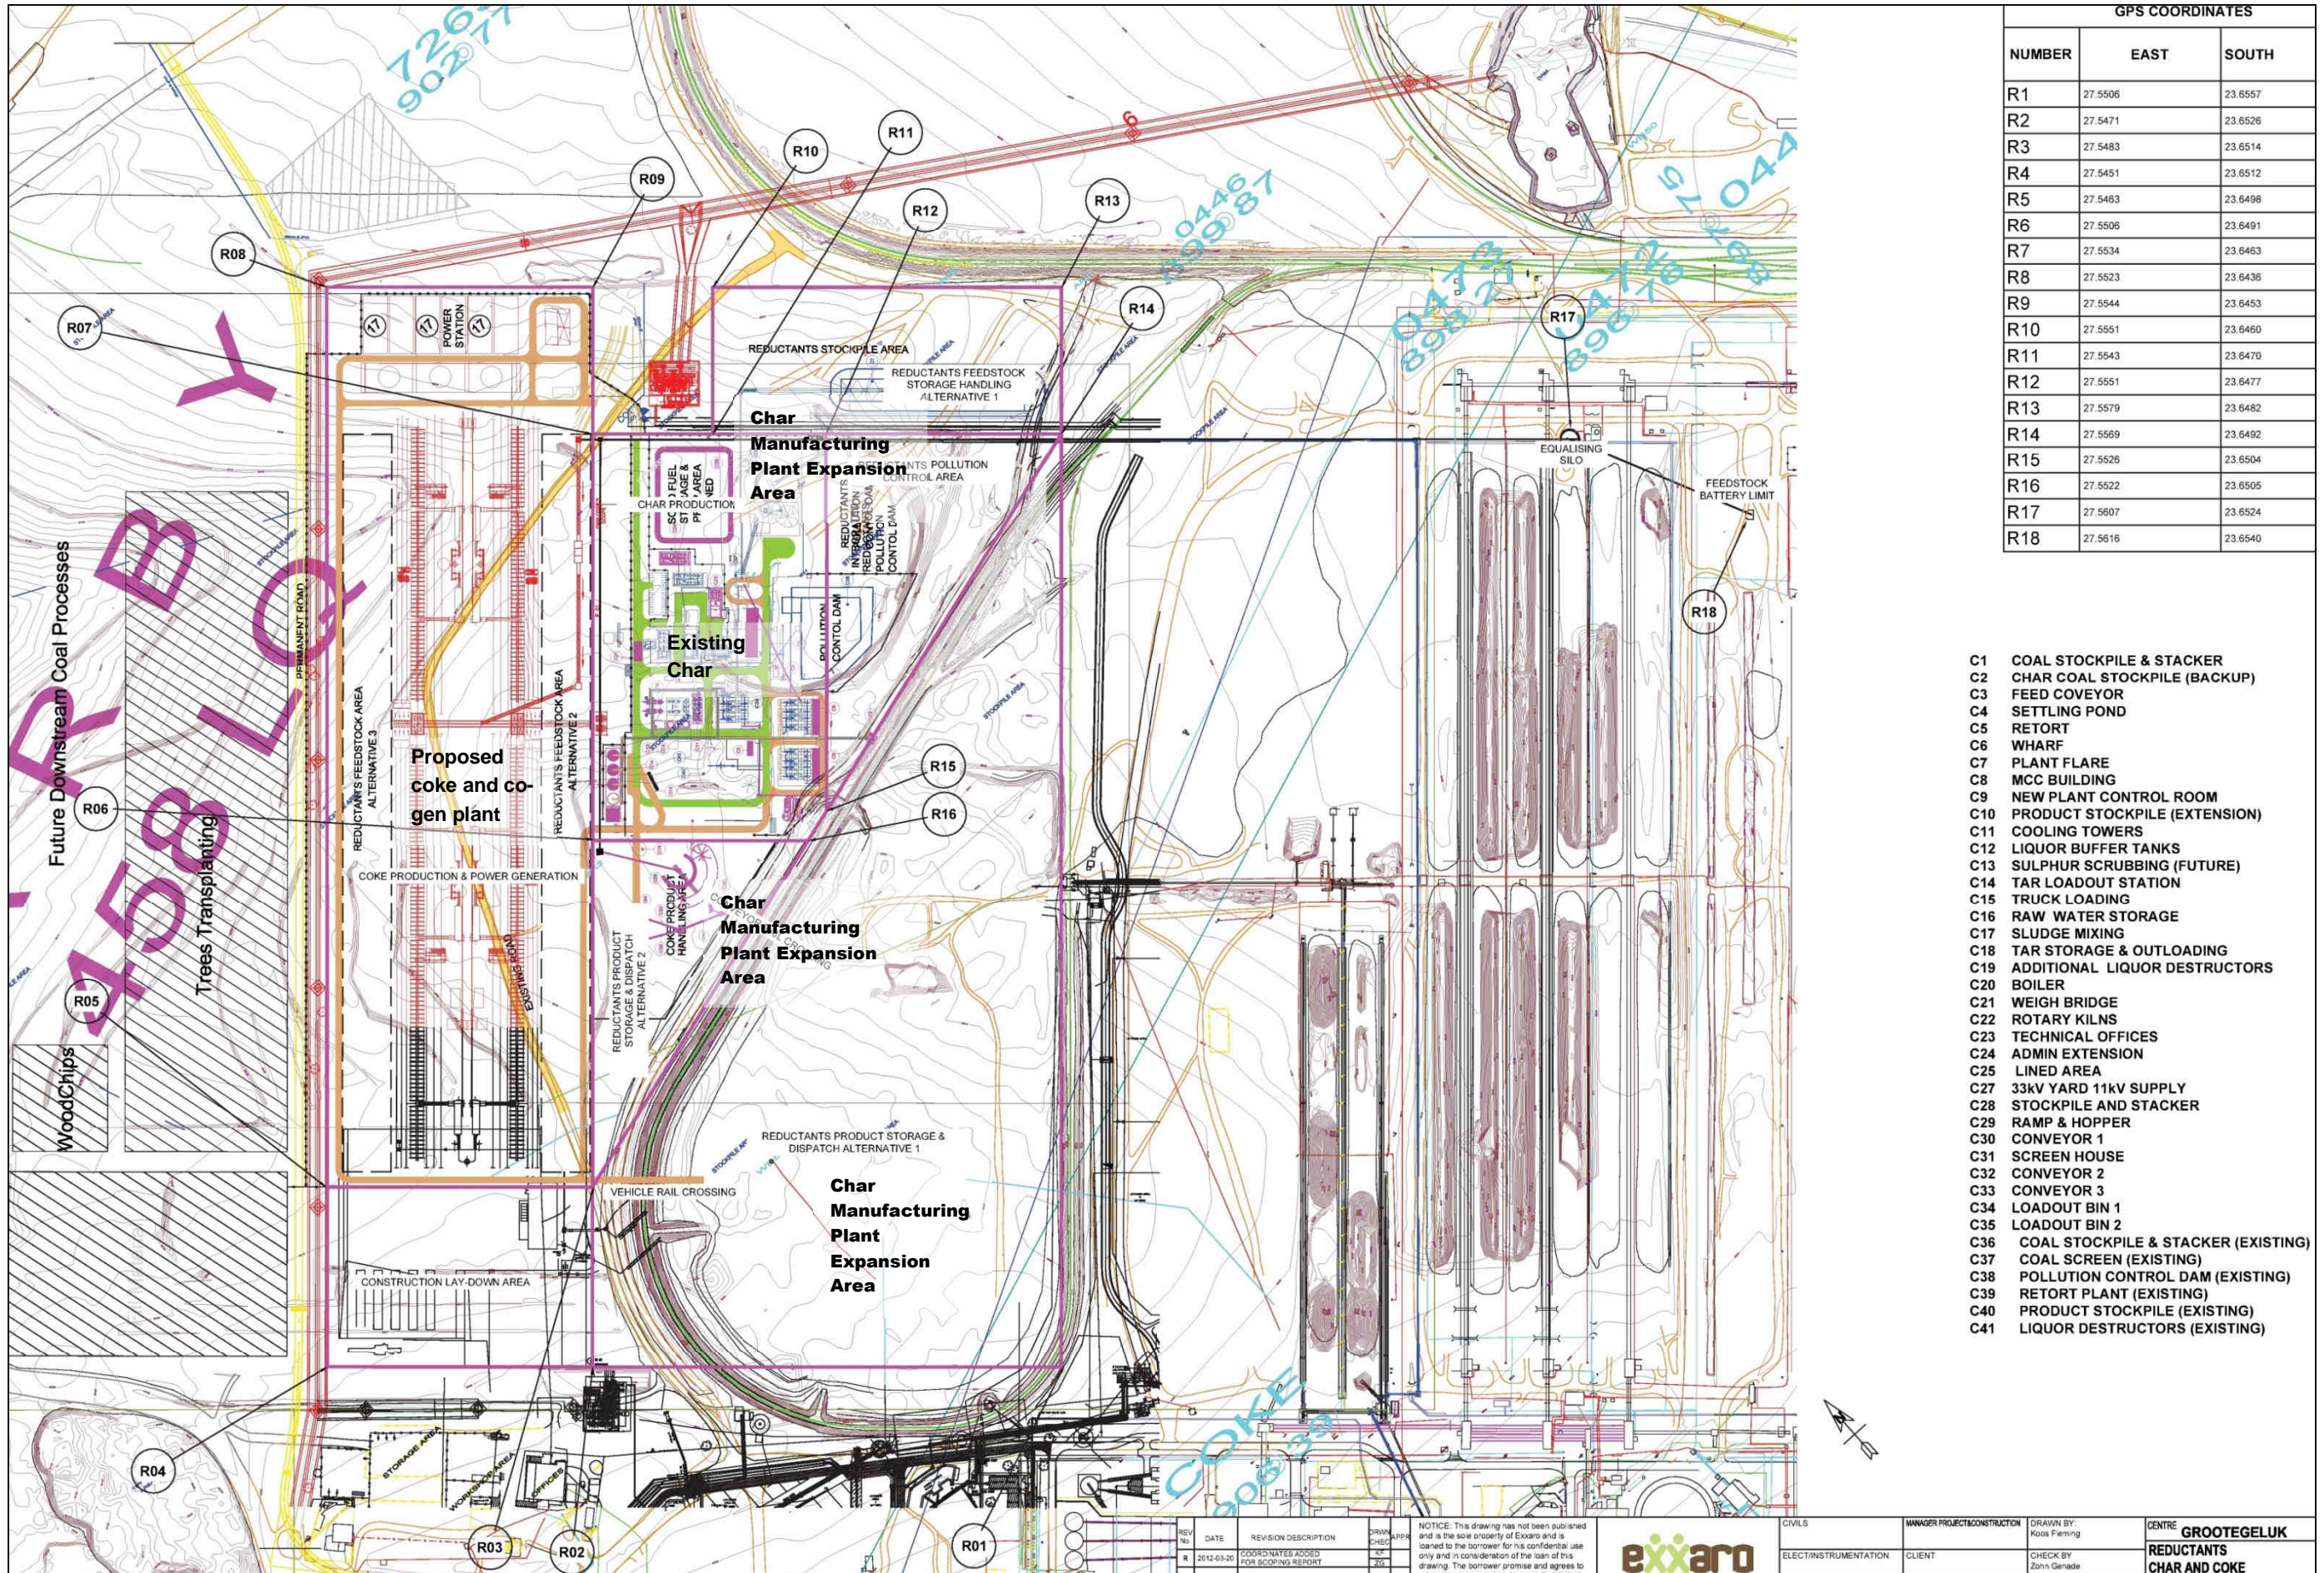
Site Layout of the existing Char Manufacturing Plant and the Char Manufacturing Plant Expansion (the Coke and Co-generation Plants are also shown on the left – currently undergoing a separate EIA)
